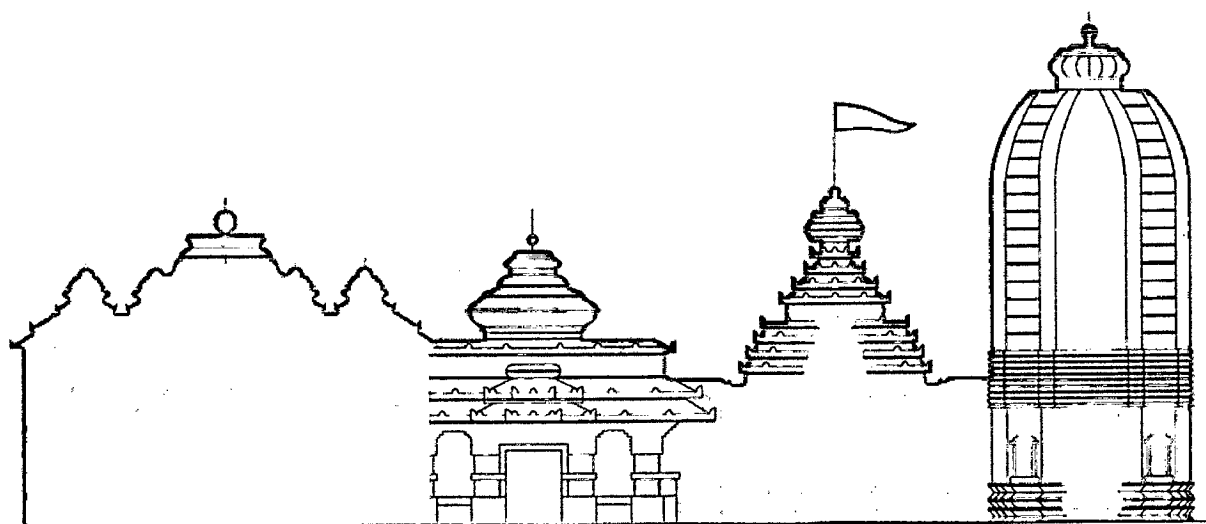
Left Side Elevation of Nila Madava temple Kantilo
